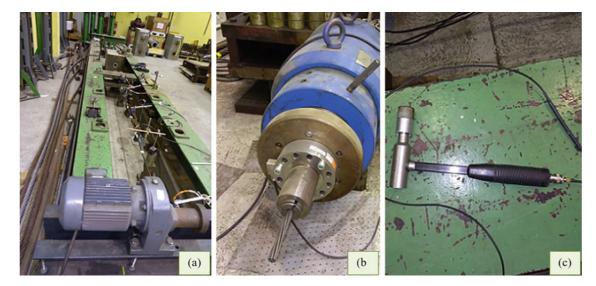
Testing means – (a): load test rig with seven-wire strand and sensors, (b): anchor and hydraulic cylinder, (c): impact hammer
